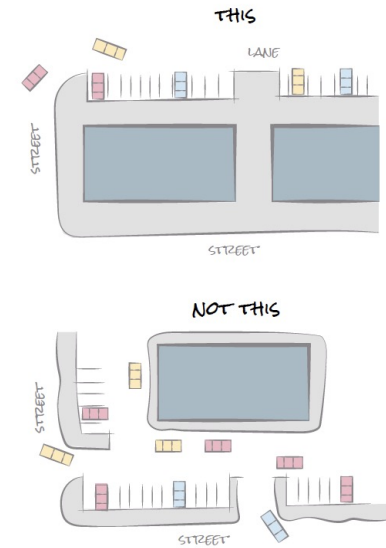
Avoid locating off-street parking between the front facade of a building and the fronting public street (3.5.g).
